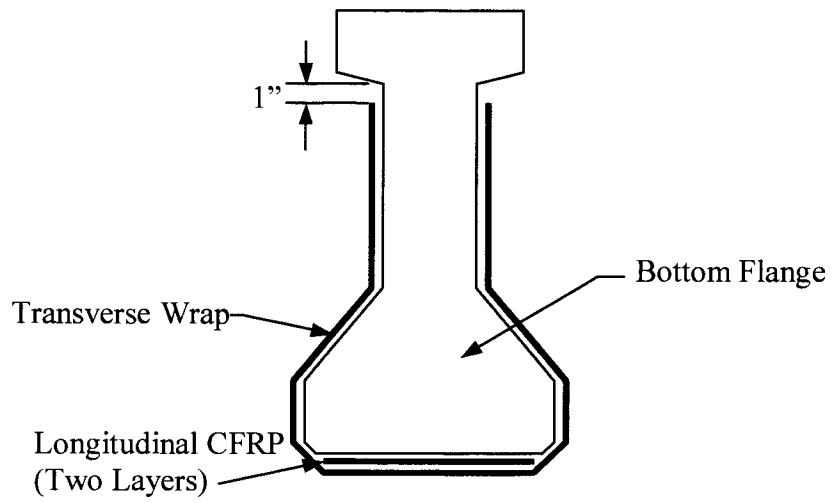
Cross-section of longitudinal and transverse wrap.
